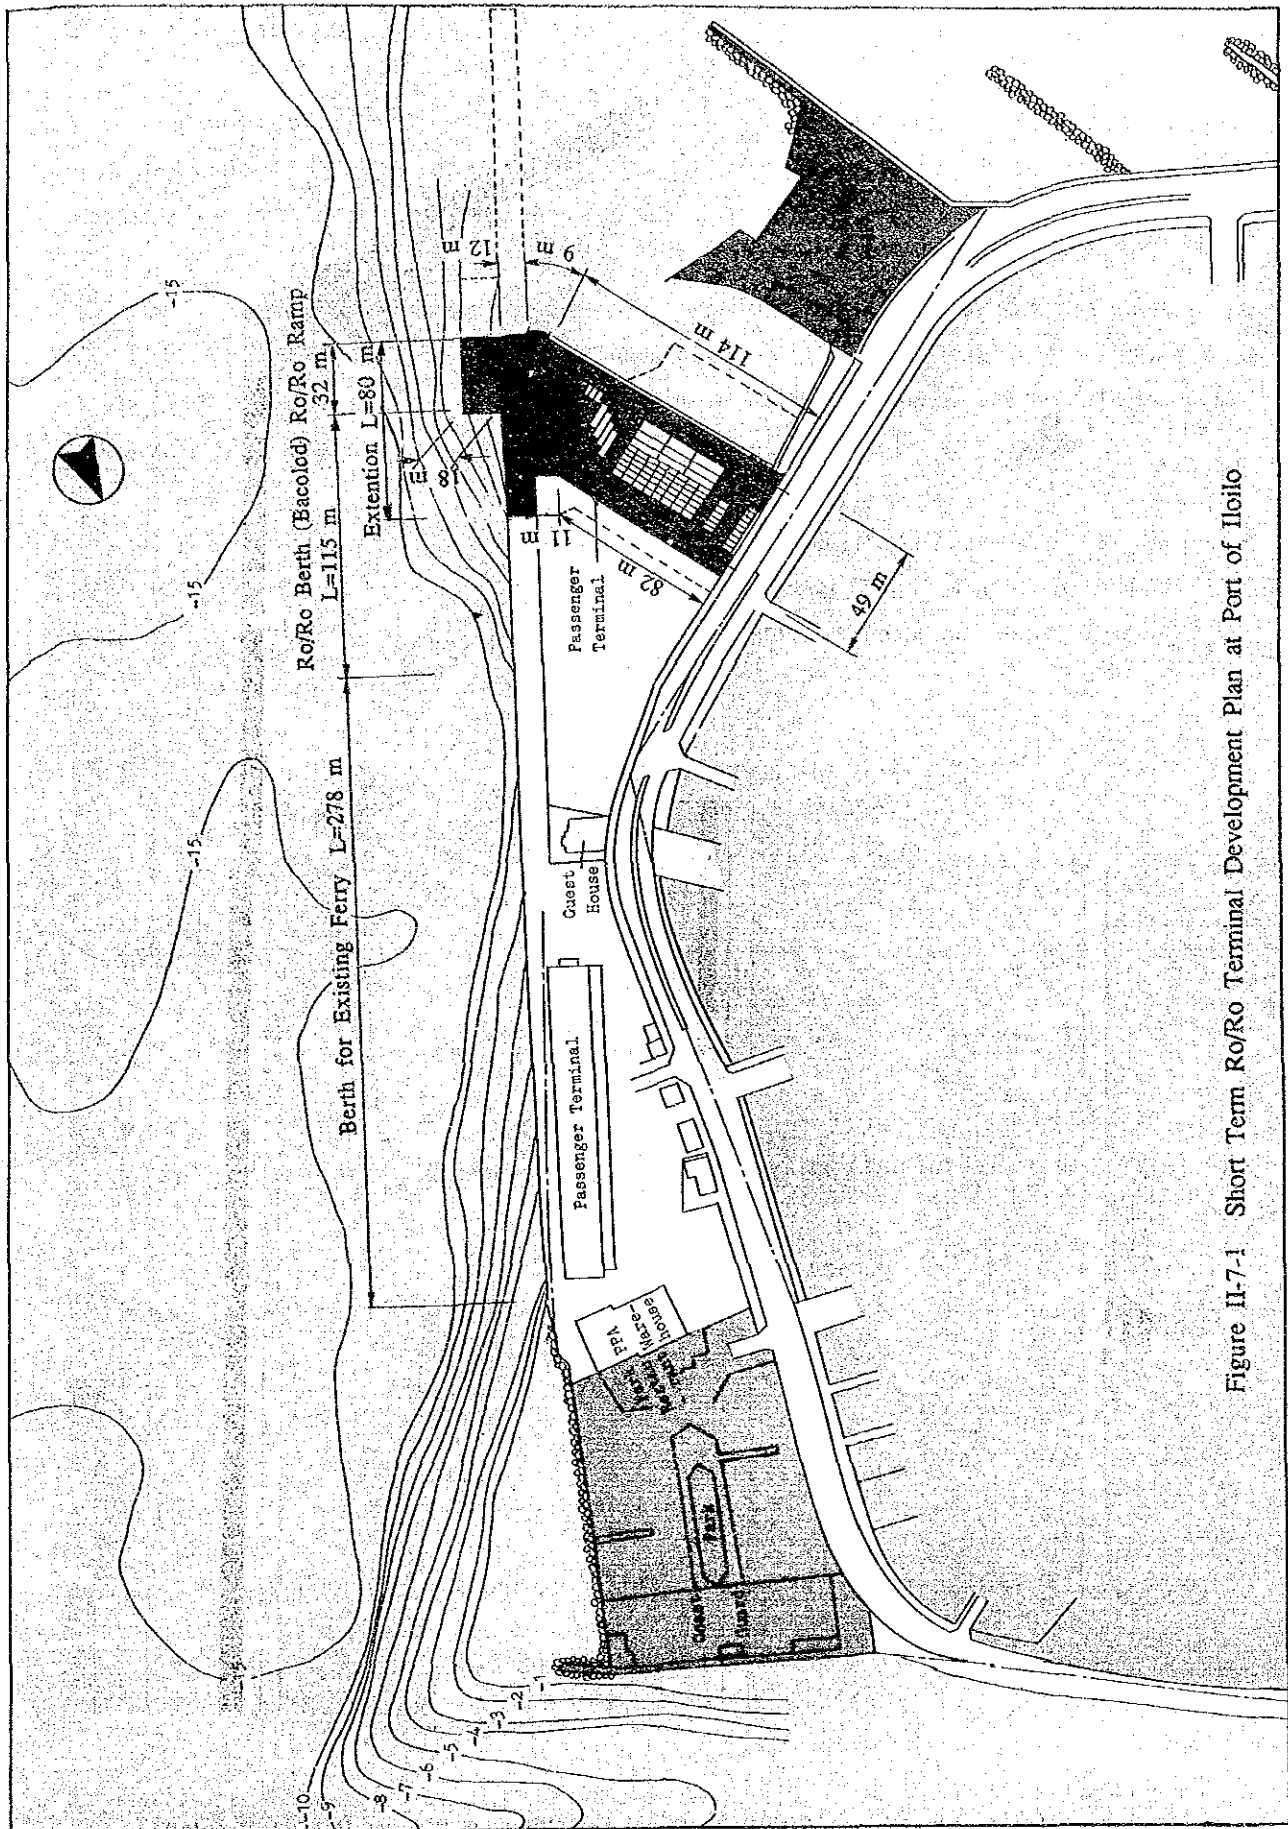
Short Term Ro/Ro Terminal Development Plan at Port of Iloilo
